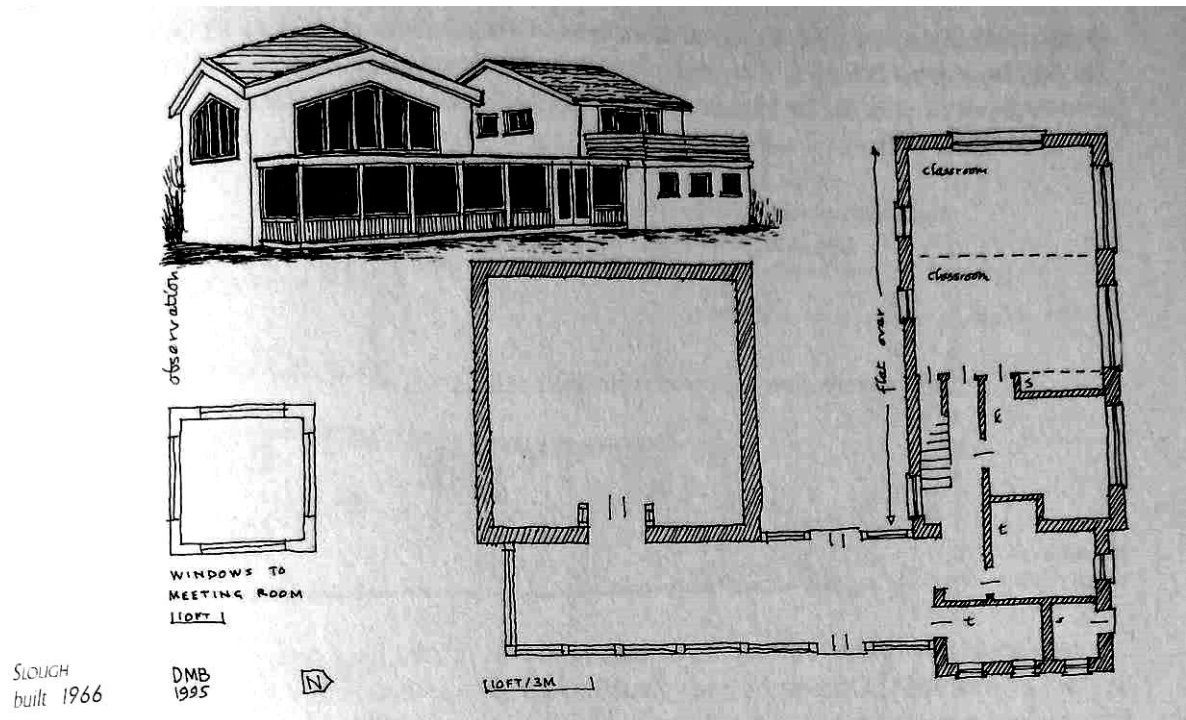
Elevation and plan, from Butler, 1990, p. 29
